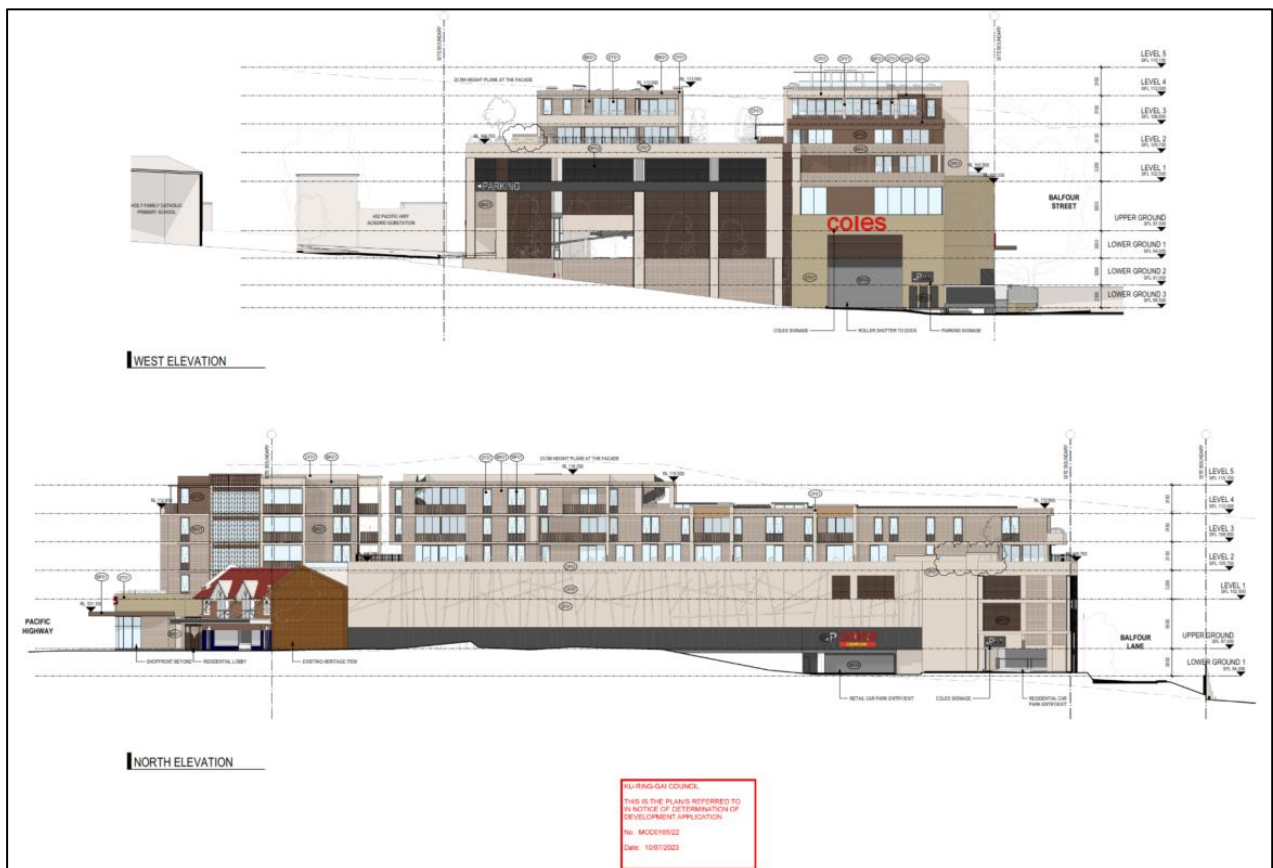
Approved MOD0185/22 West and North Elevations (Source: Rothelowman)
